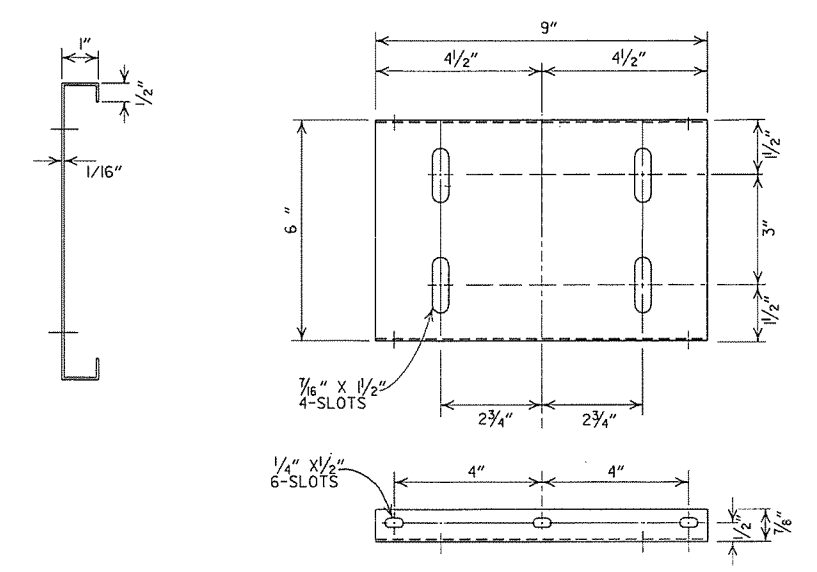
DETAIL OF TERMINAL ANCHOR POST (TYPE I)
